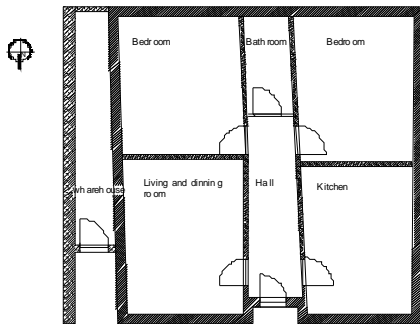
Schematic plan of the ground floor of the single-family detached building studied
